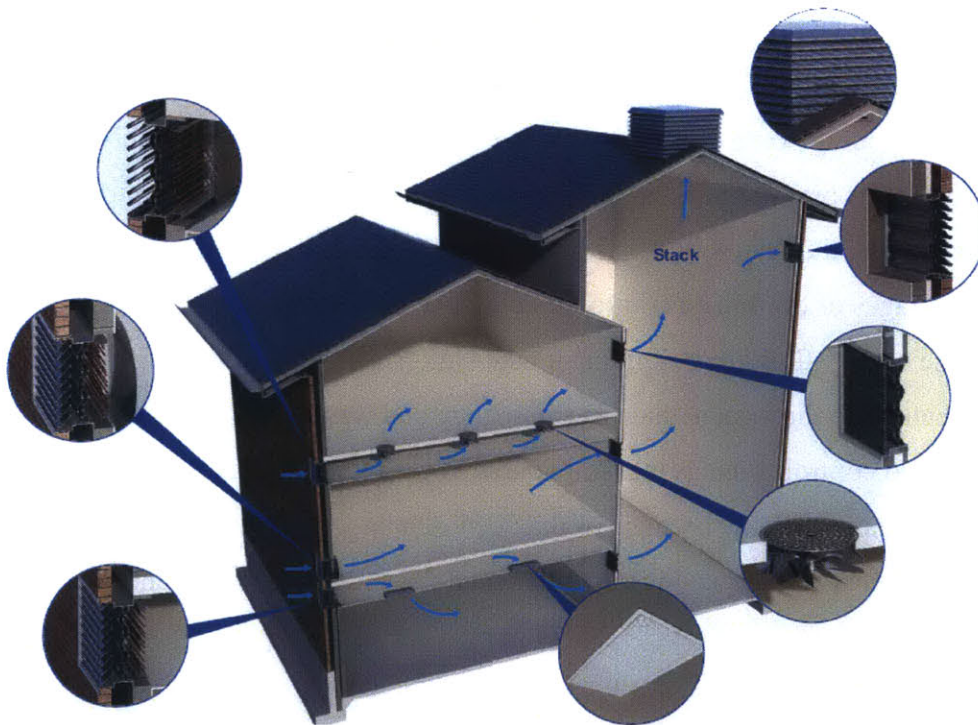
Typical natural ventilation systems, including louvre intake and damper arrangement, floor and ceiling grilles, ceiling laminar flow diffusers, floor outlet swirl diffusers, transfer grilles, exhaust wall outlets, penthouse exhaust turret (going clockwise from top left bubble) [8]
